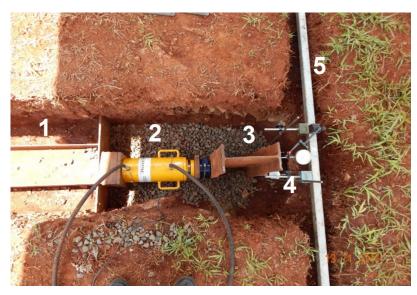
Details of the system used in horizontal load tests. View from above. (1) steel profile (supported on the concrete pile to the left); (2) hydraulic jack; (3) steel profile to be tested; (4) strain gauges; (5) reference beam to support the strain gauges.
